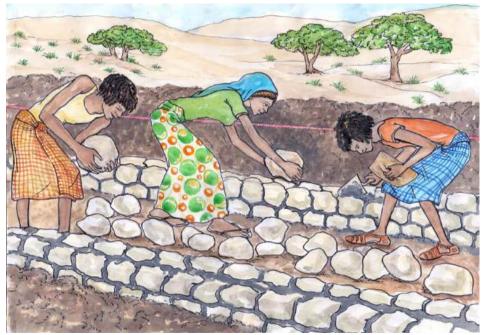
The counter wall on the left was constructed and the main wall is under way of construction.
